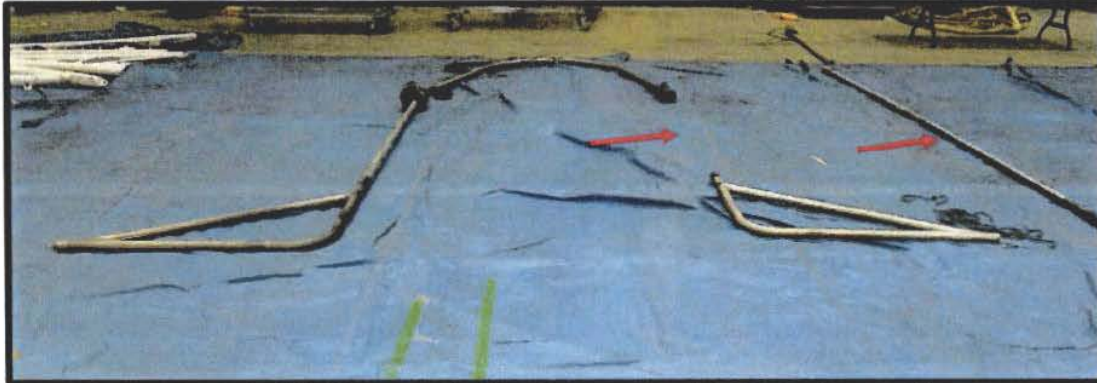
, Wishbone missing section, Fin Tip Pole Assembly
